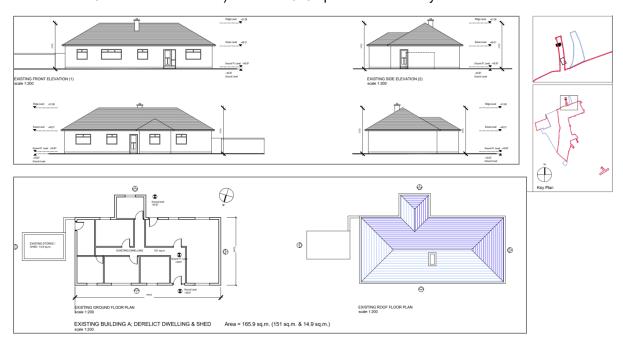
Drawing extracts showing the existing dwelling located off Flemington Lane which is proposed for demolition.
